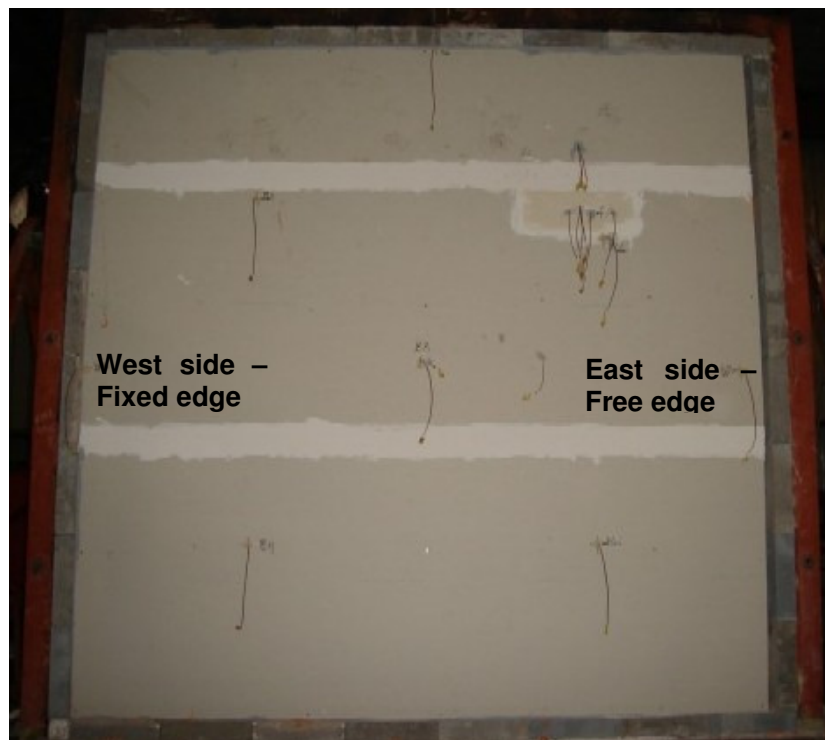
Unexposed face of test specimen prior to commencement test.
